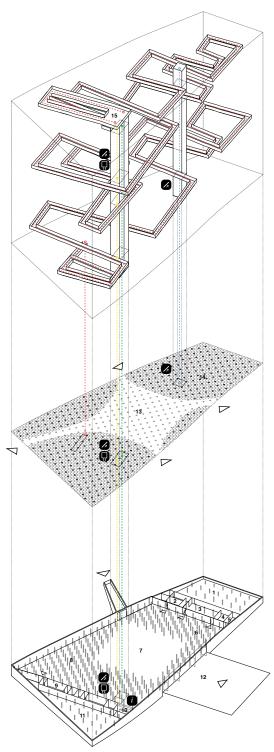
Vertical Transportation Systems consist of 2 stairs, 1 elevator, and 1 continuous ramp-way
